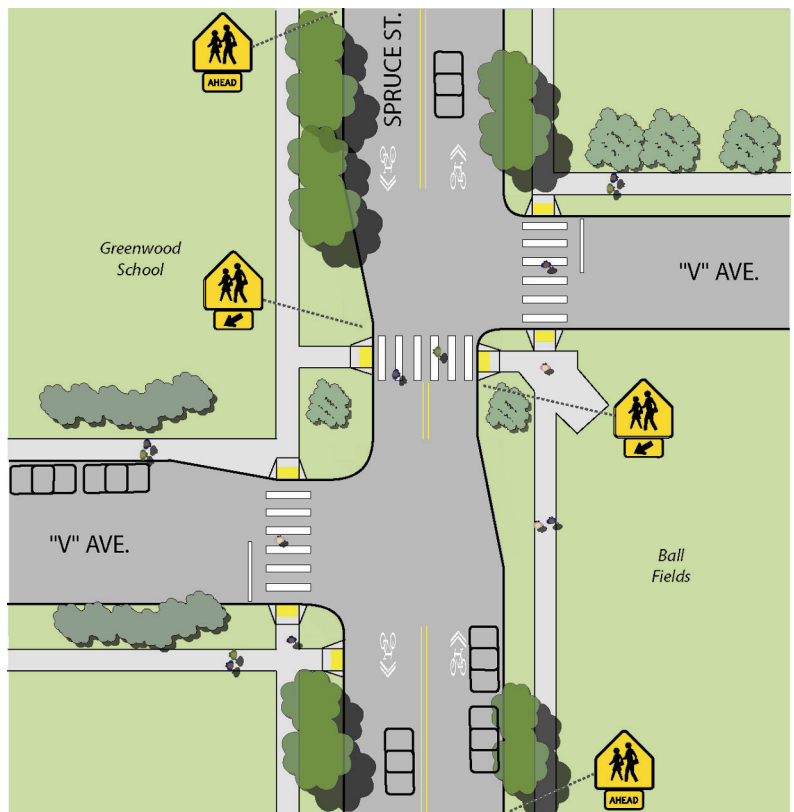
Concept Depicting Potential Spruce Street and "V" Avenue Crossing Improvements
